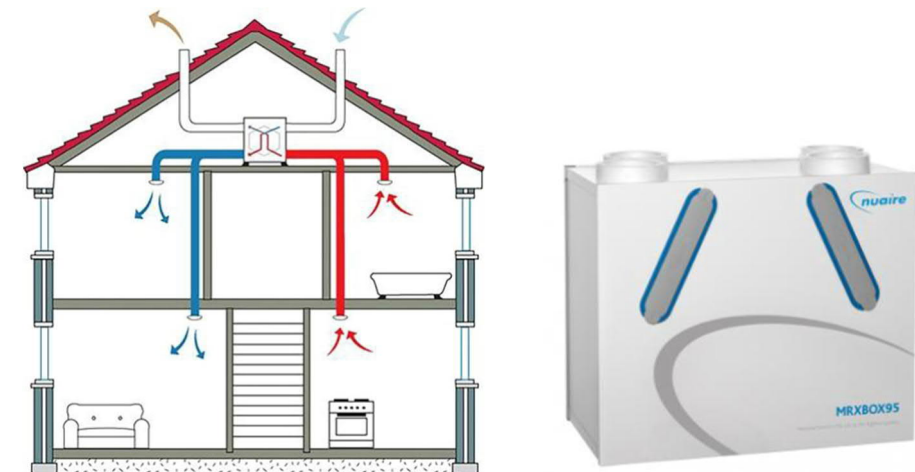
Typical MVHR layout in a dwelling and typical MVHR unit
